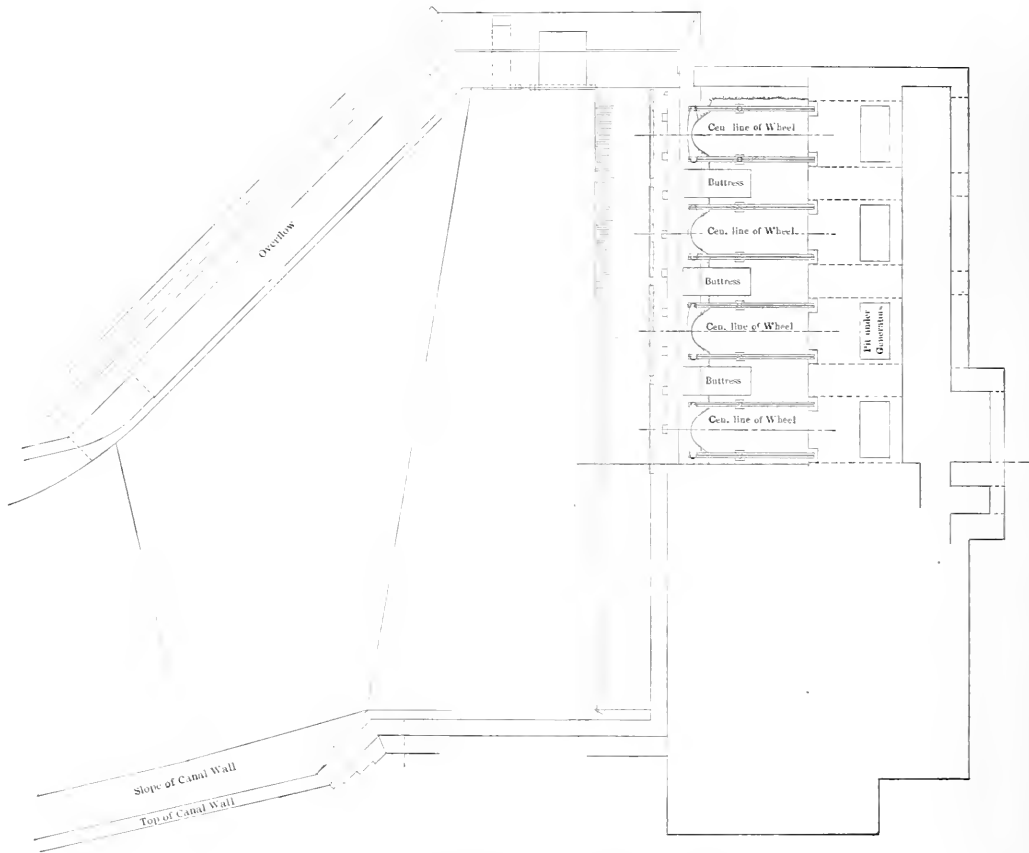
PLAN OF FOUNDATION AND FOREBAY WALLS, GARVIN'S FALLS, N. H.
